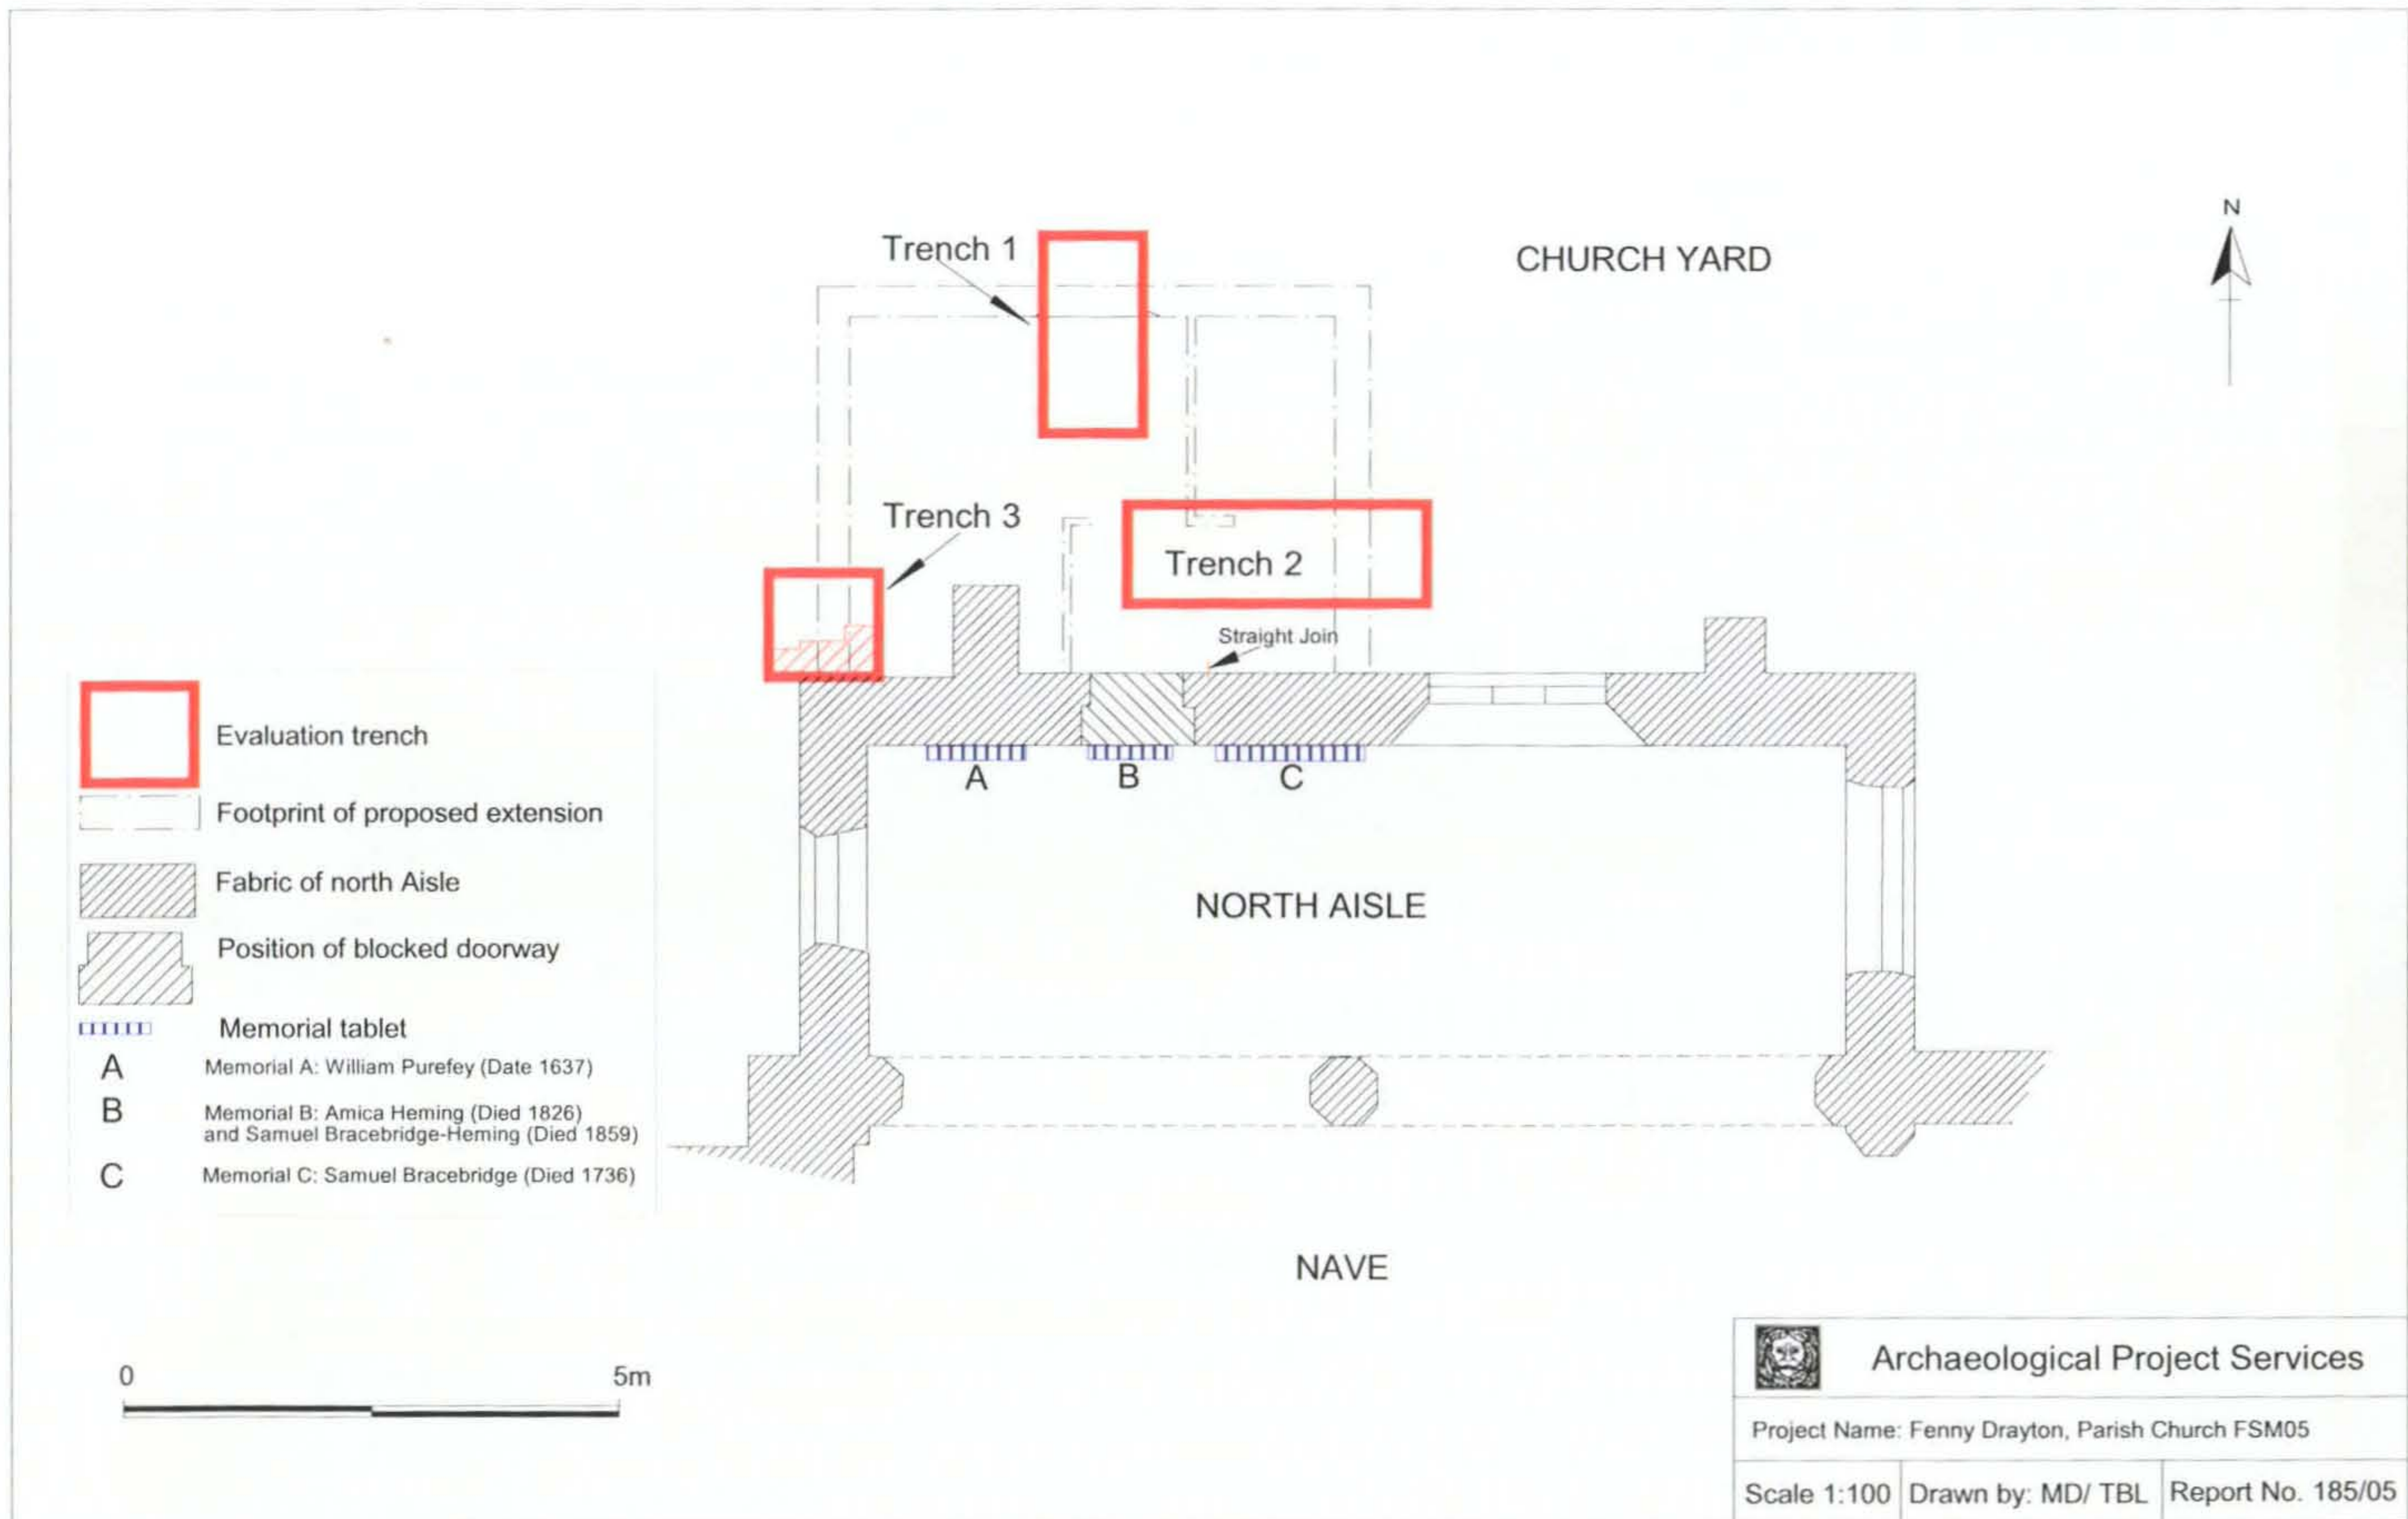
Plan of proposed development showing location of trenches and affected monuments
